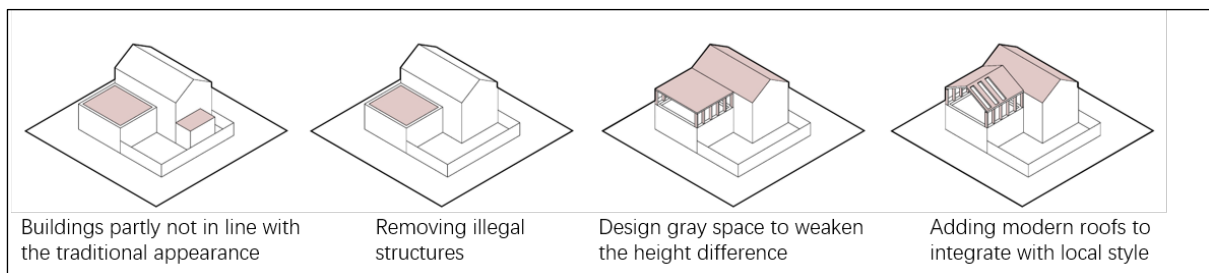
Adaptive architectural renewal: Gray space improvement
